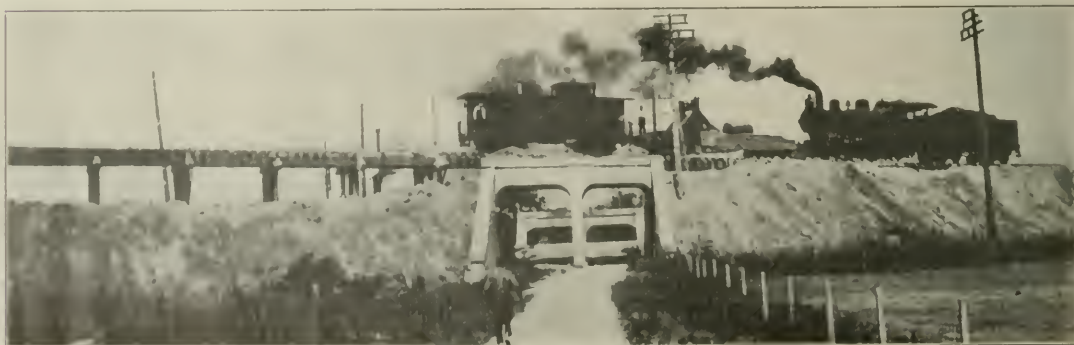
Double Box Center Subway for Highway on Traction Line Change; Vandalia Track Elevation.
